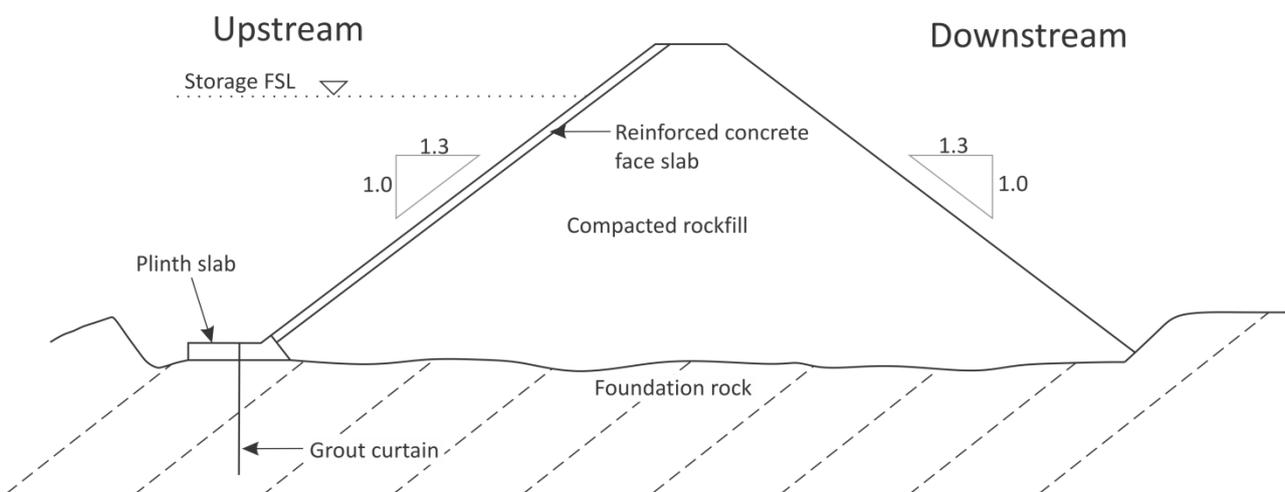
Schematic cross-section diagram of a concrete faced rockfill dam.
